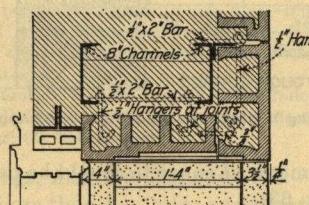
Section through paneled soffit and lintel forming part of terra cotta facing.
